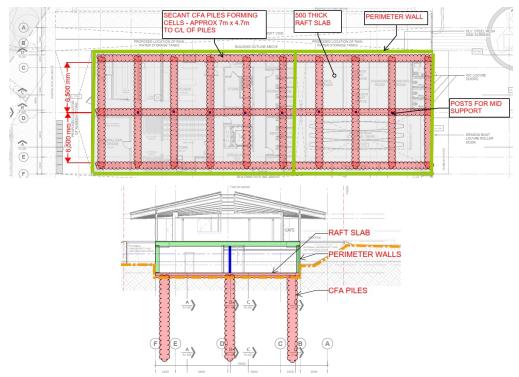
Cellular secant CFA piles (plan top and cross section bottom)
